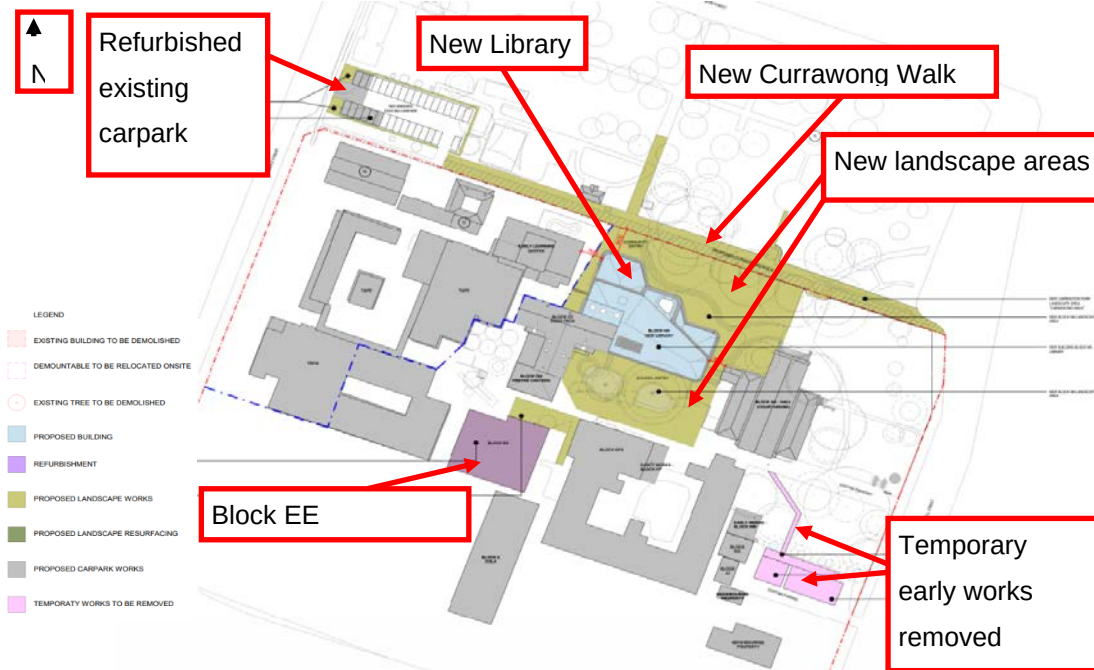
| Block EE layout (Source: Applicant's EIS 2019)
